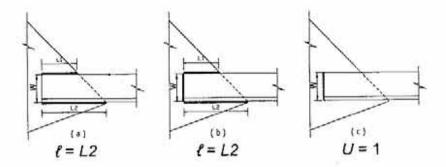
Determination of ℓ in Welded Connections
